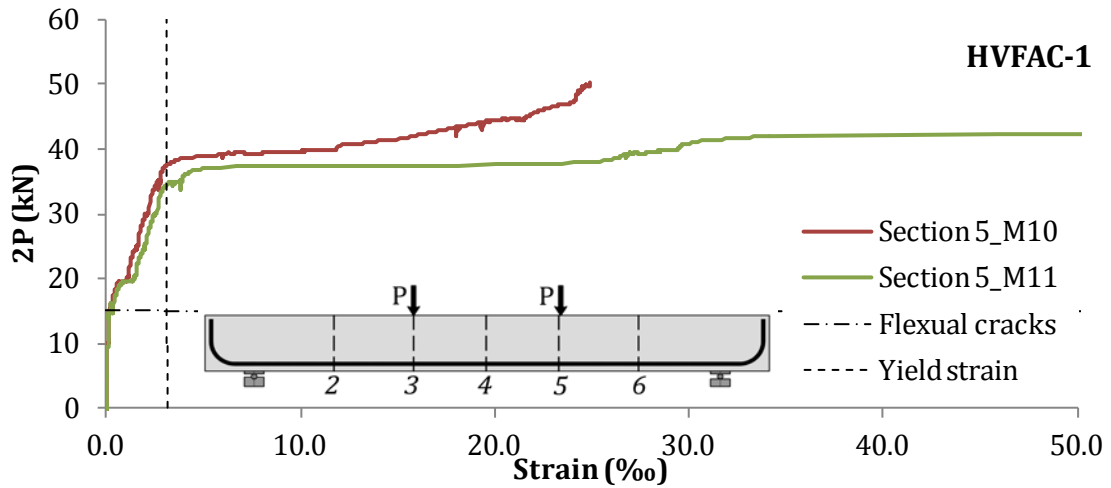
Longitudinal reinforcement strains in the HVFAC-1 beam in section 5
